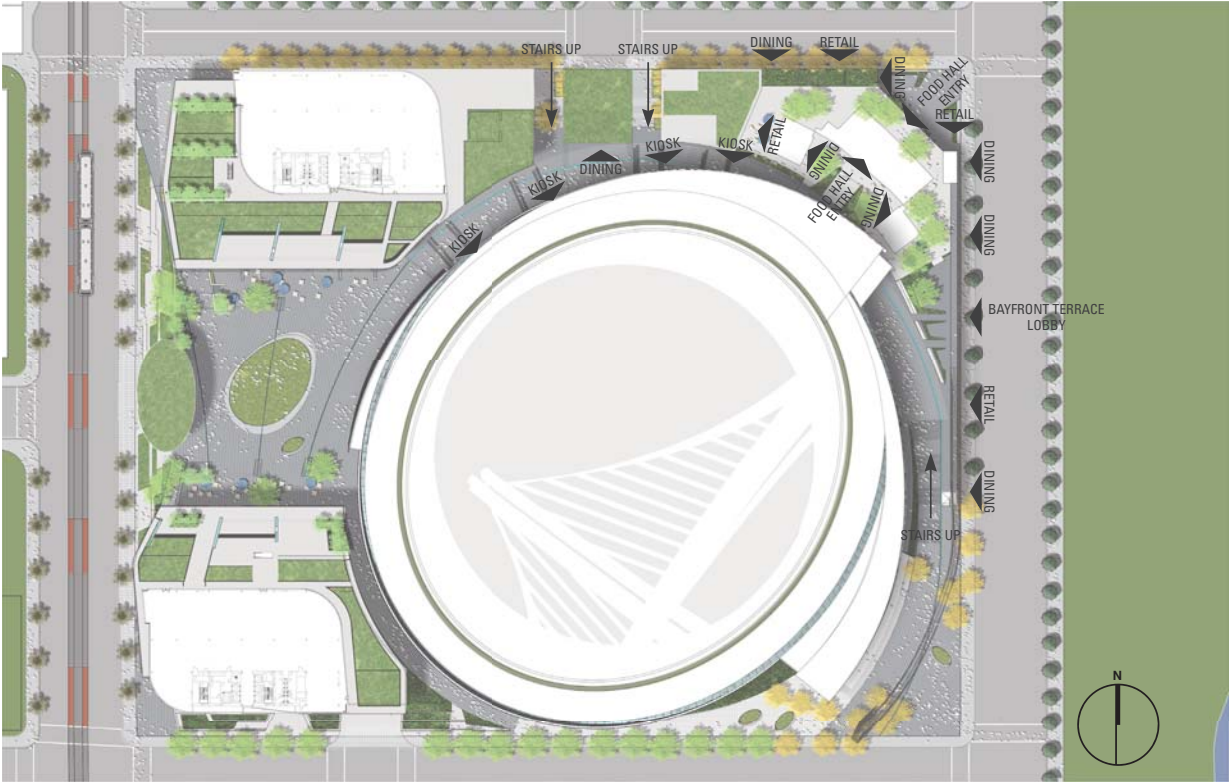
| SITE PLAN - BUILDING ENTRY POINTS
